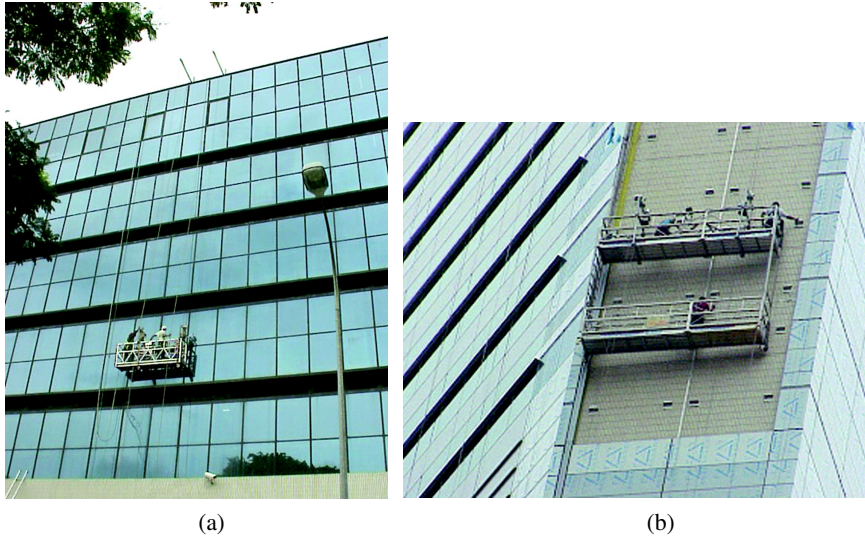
Temporary suspended platform on davits. (a) Single deck. (b) Double deck.
